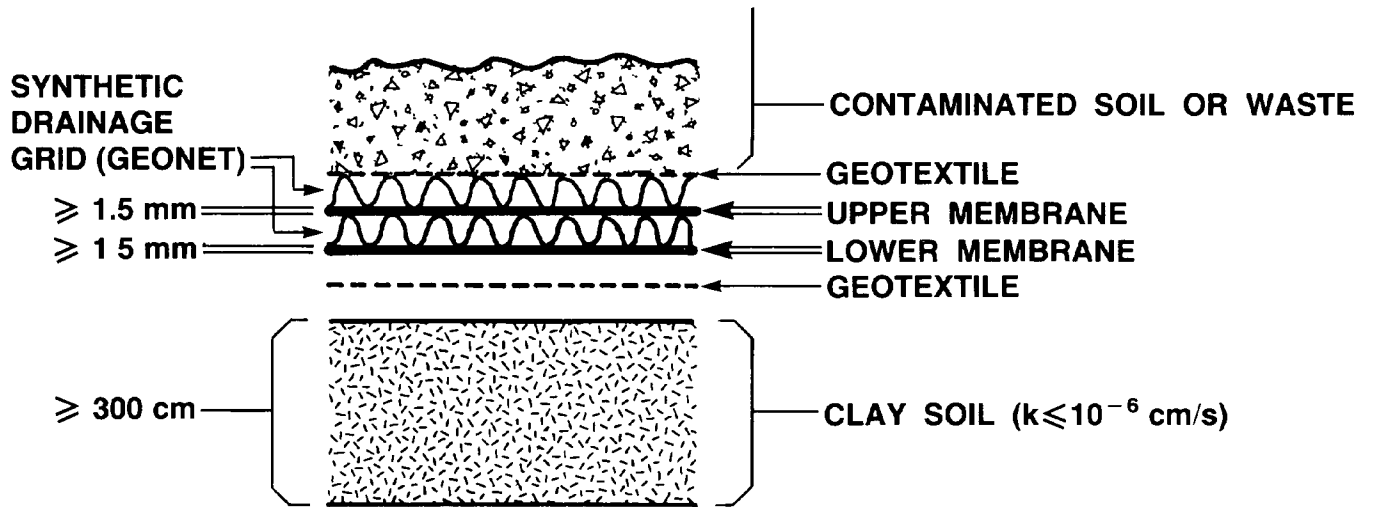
Cross-section of Cell Side in Impermeable Hazardous Waste Cell (Maximum Security Type, LaSalle, Quebec)
